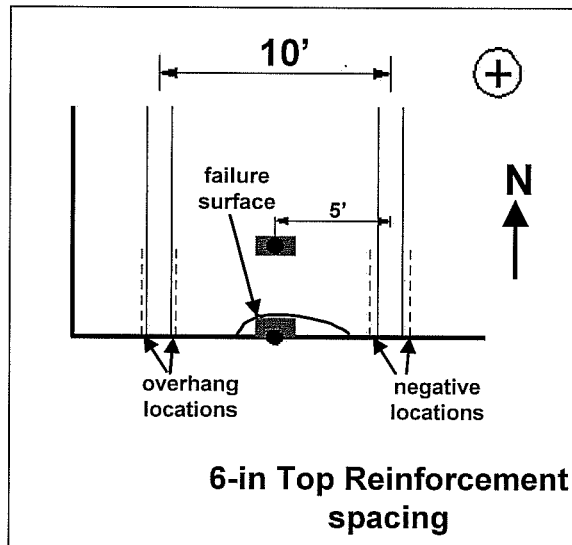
6 in. top reinforcement spacing, positive-moment region (Test Area 3)
